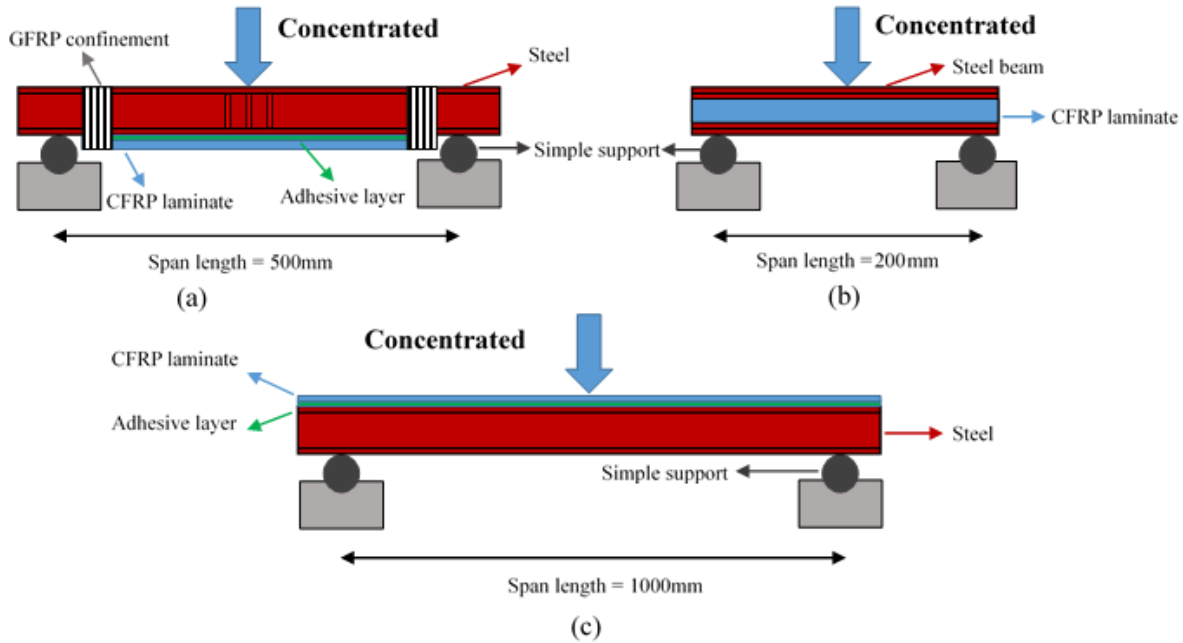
Three-point bending test set-up for specimens with (a) flexural failure, (b) shear failure, and (c) lateral-torsional failure.
